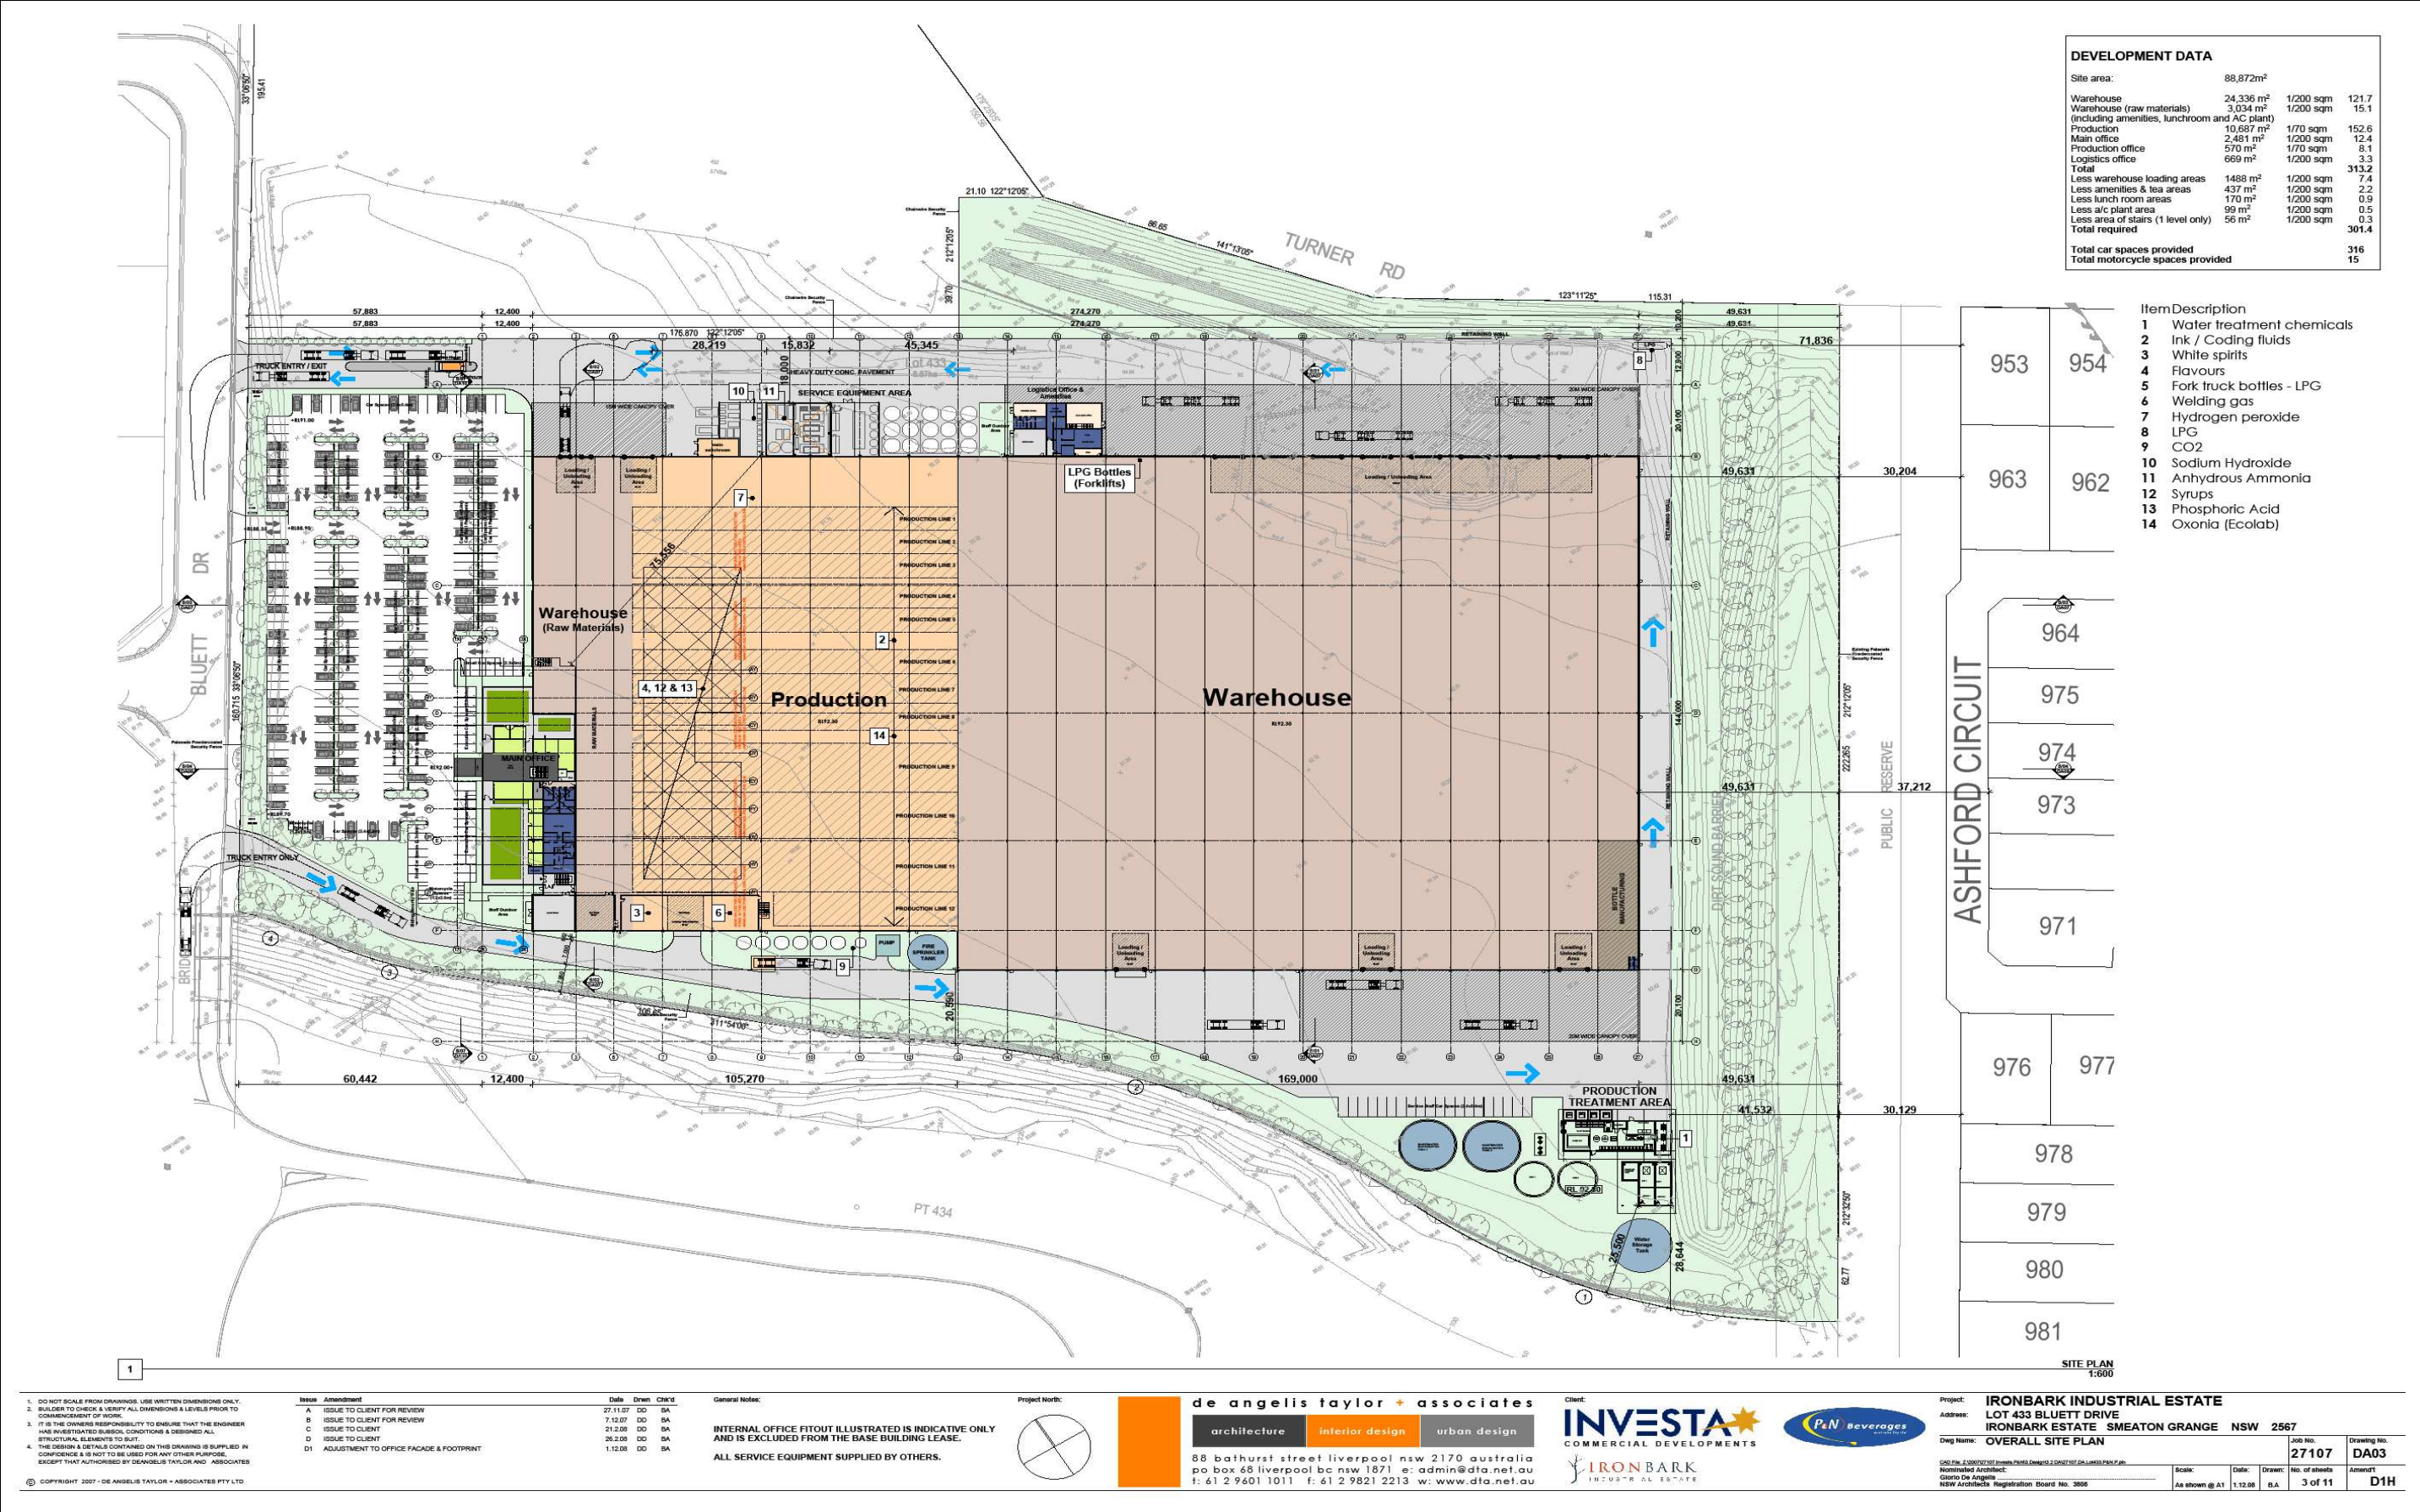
Site Plan of Proposed P&N Beverages Manufacturing Facility – Smeaton Grange (Source: De Angelis Taylor and Associates drawing DA03, date: 26/11/08)
